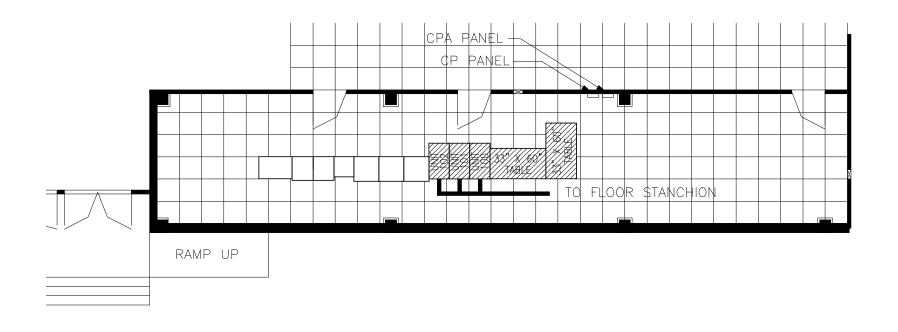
FAAAC Equipment Area Site Ground Connection
